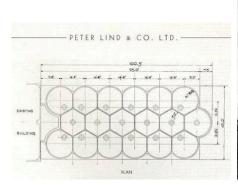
Showing the construction of the reinforced concrete Shredded Wheat Factory c.1924 [© Welwyn Garden City Heritage Trust website]
